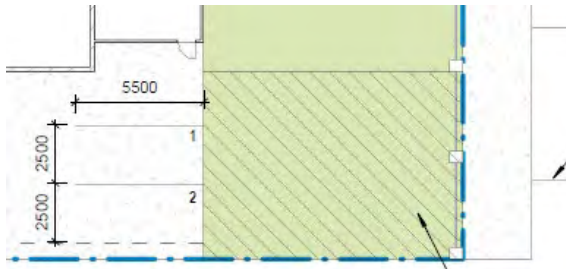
Landscaping to southern boundary of lot in place of driveway to Hartley Street – Proposed Site Plan, prepared by Funarchi, 25/03/2026
